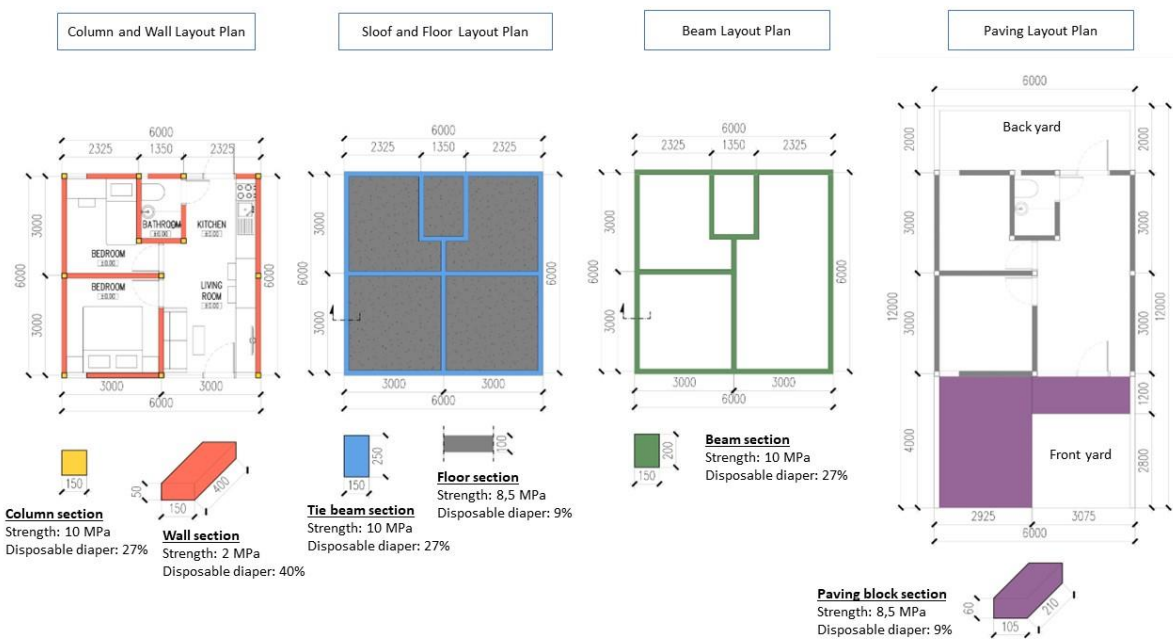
Layout Plan for Low-Cost Building Materials Utilizing Disposable Diapers
